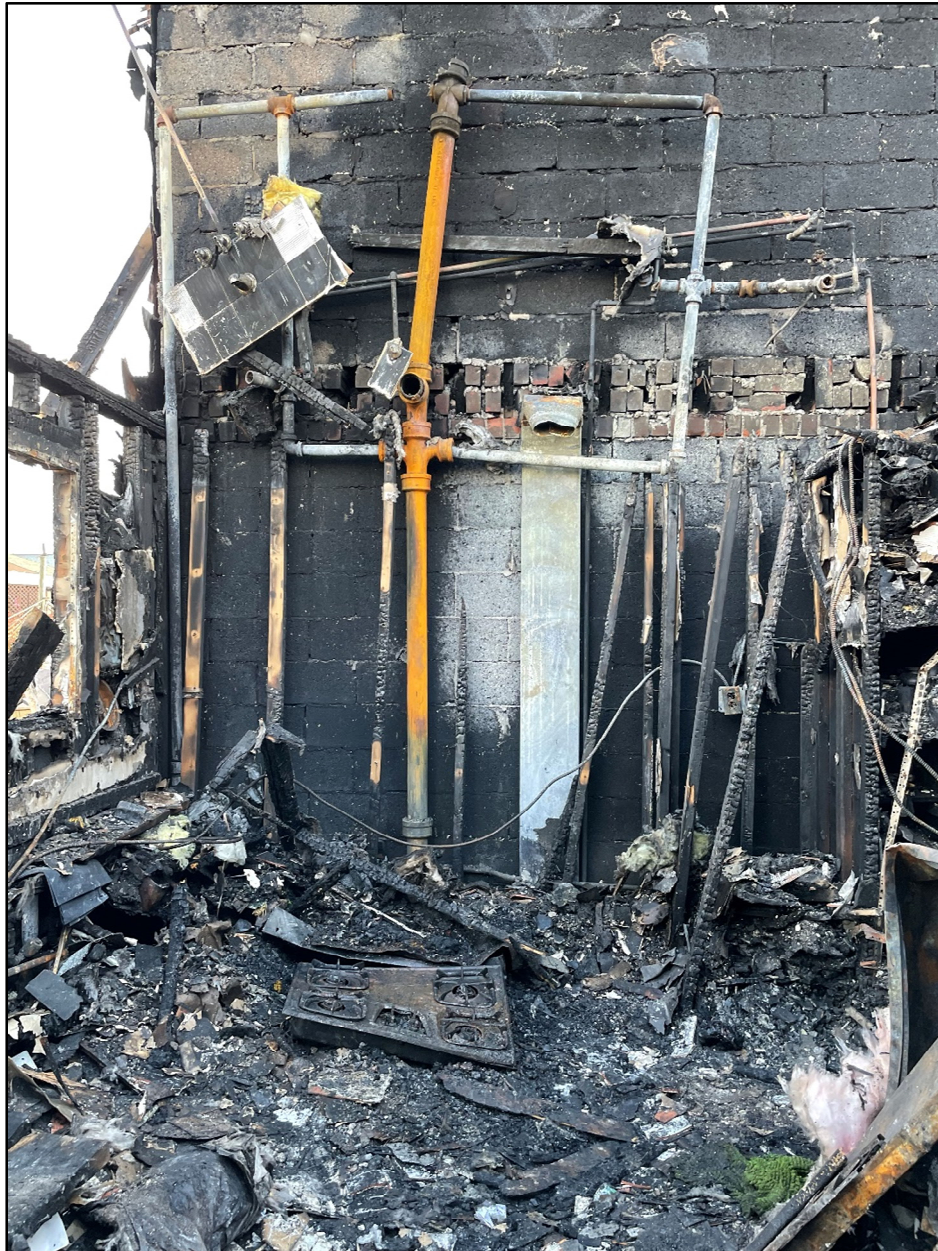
View of kitchen area against the demising wall of the Fire Building on the first floor.
